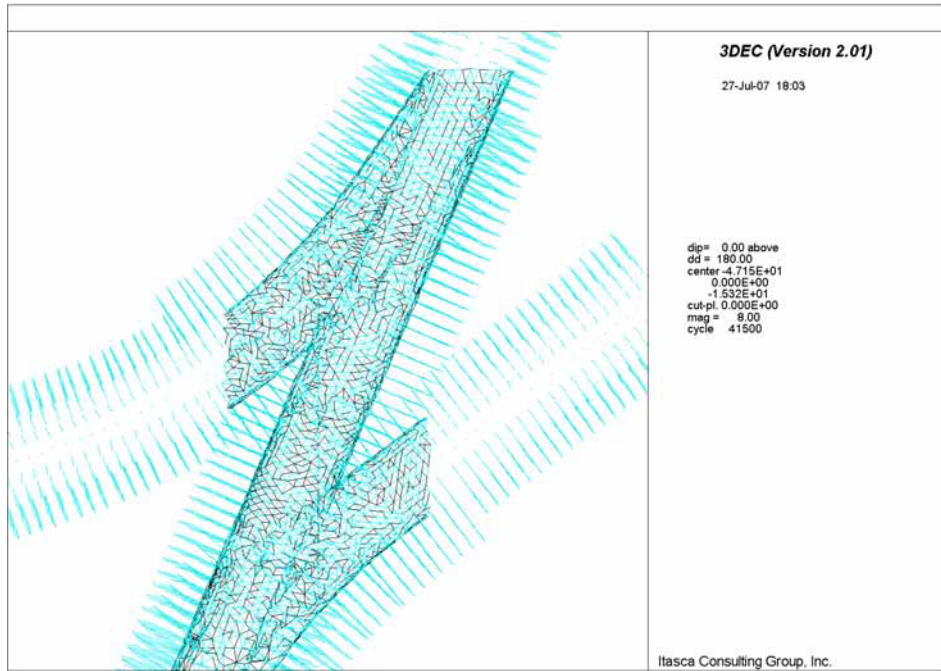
Plan View of Rock Bolts and Shotcrete at Intersection of Access Main and Turnout
